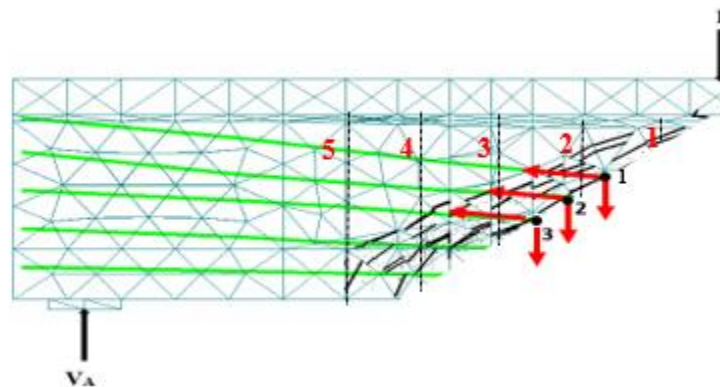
Cross-section cracked in shear in beam T-R0.
